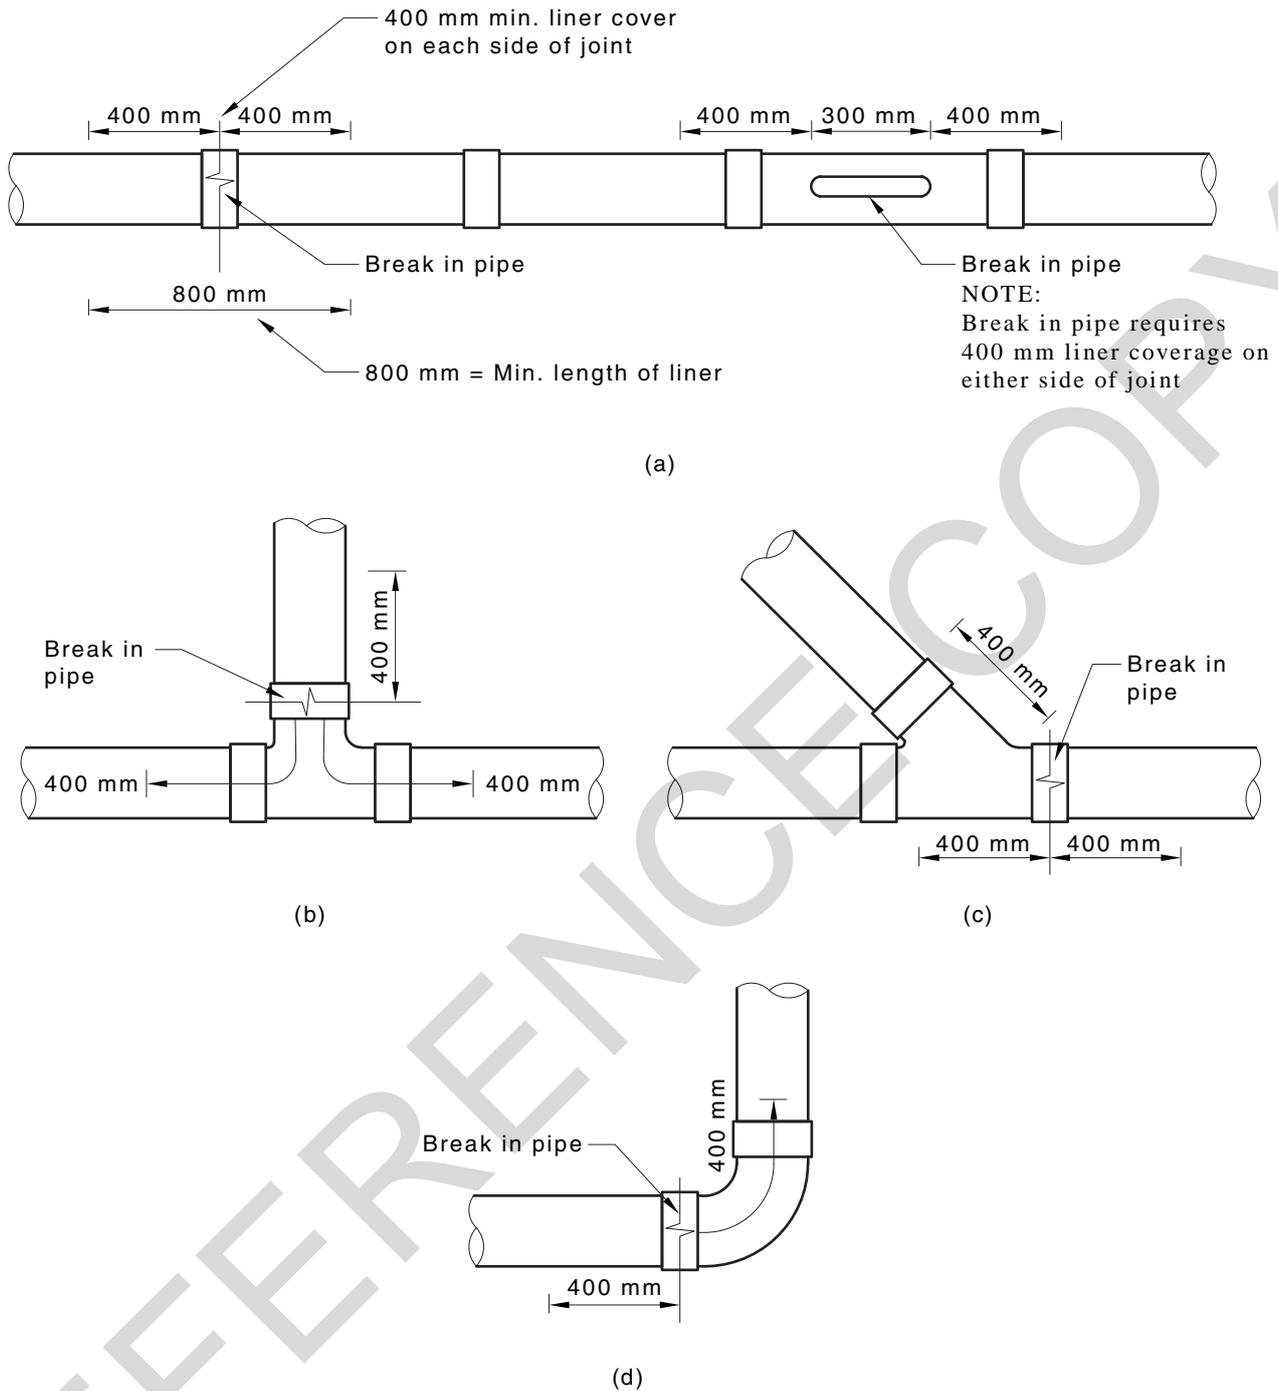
MINIMUM LENGTH OF LINER FOR A DAMAGED PIPE OR FITTING
